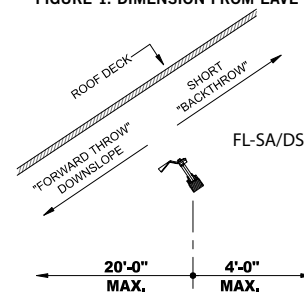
SPRINKLER FRAME ORIENTATION TO ROOF SLOPE
